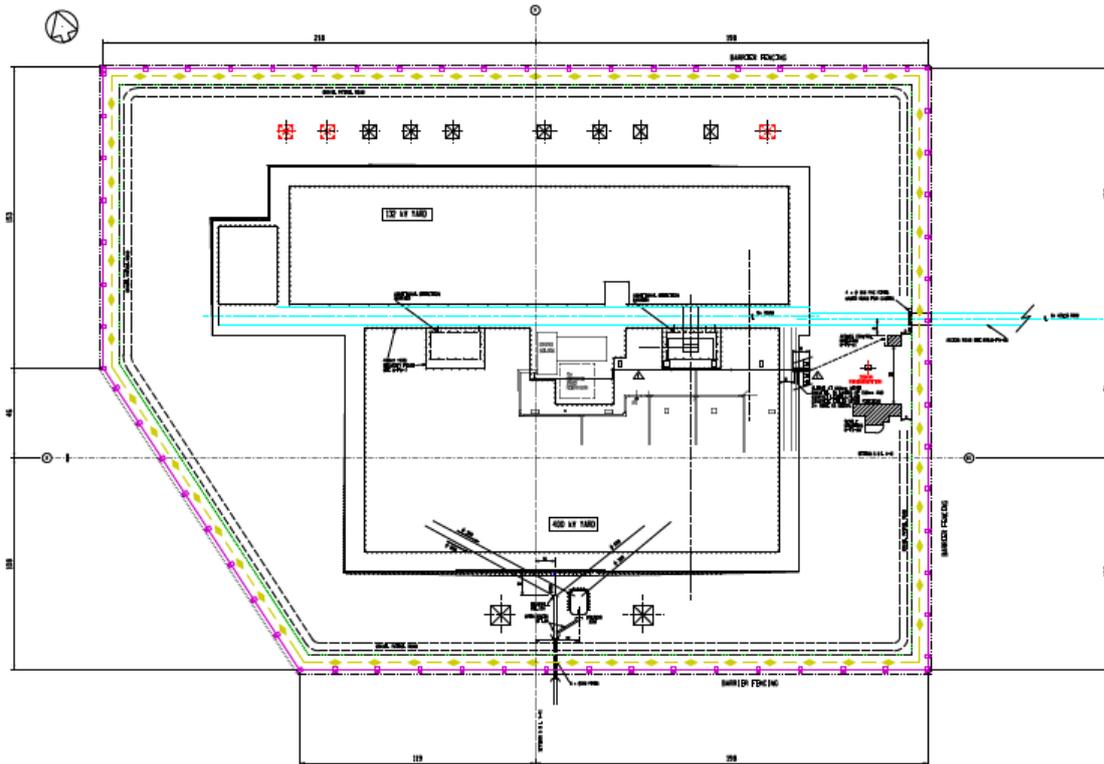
Typical Tx Substation site layout (refer to drawing THE22P02-SE-42)
